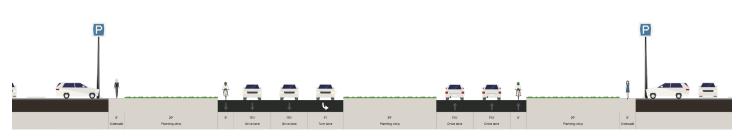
NORTH OF WHITEWAY DRIVE TYPICAL SECTION
